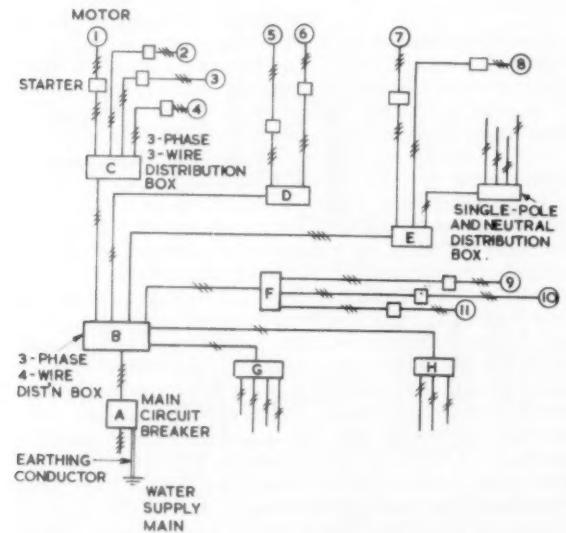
Schematic diagram of a section of a power and lighting installation
